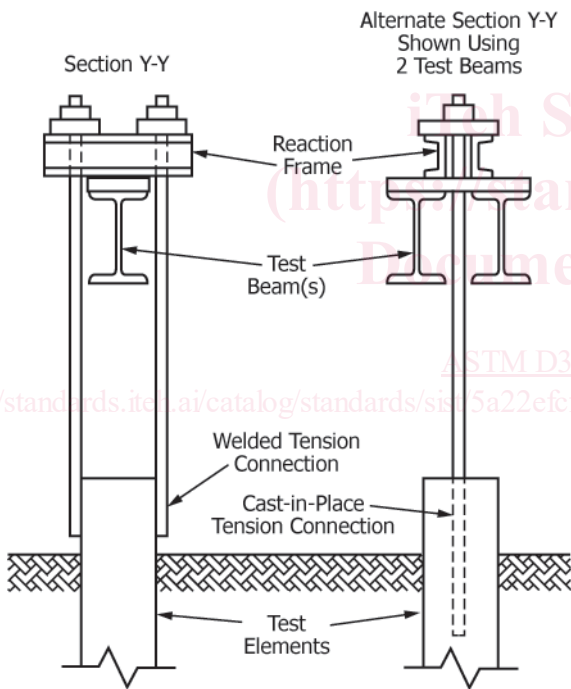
Typical Section Y-Y (Fig. 4, Fig. 6) of Test Beam(s) at Test Element(s)
